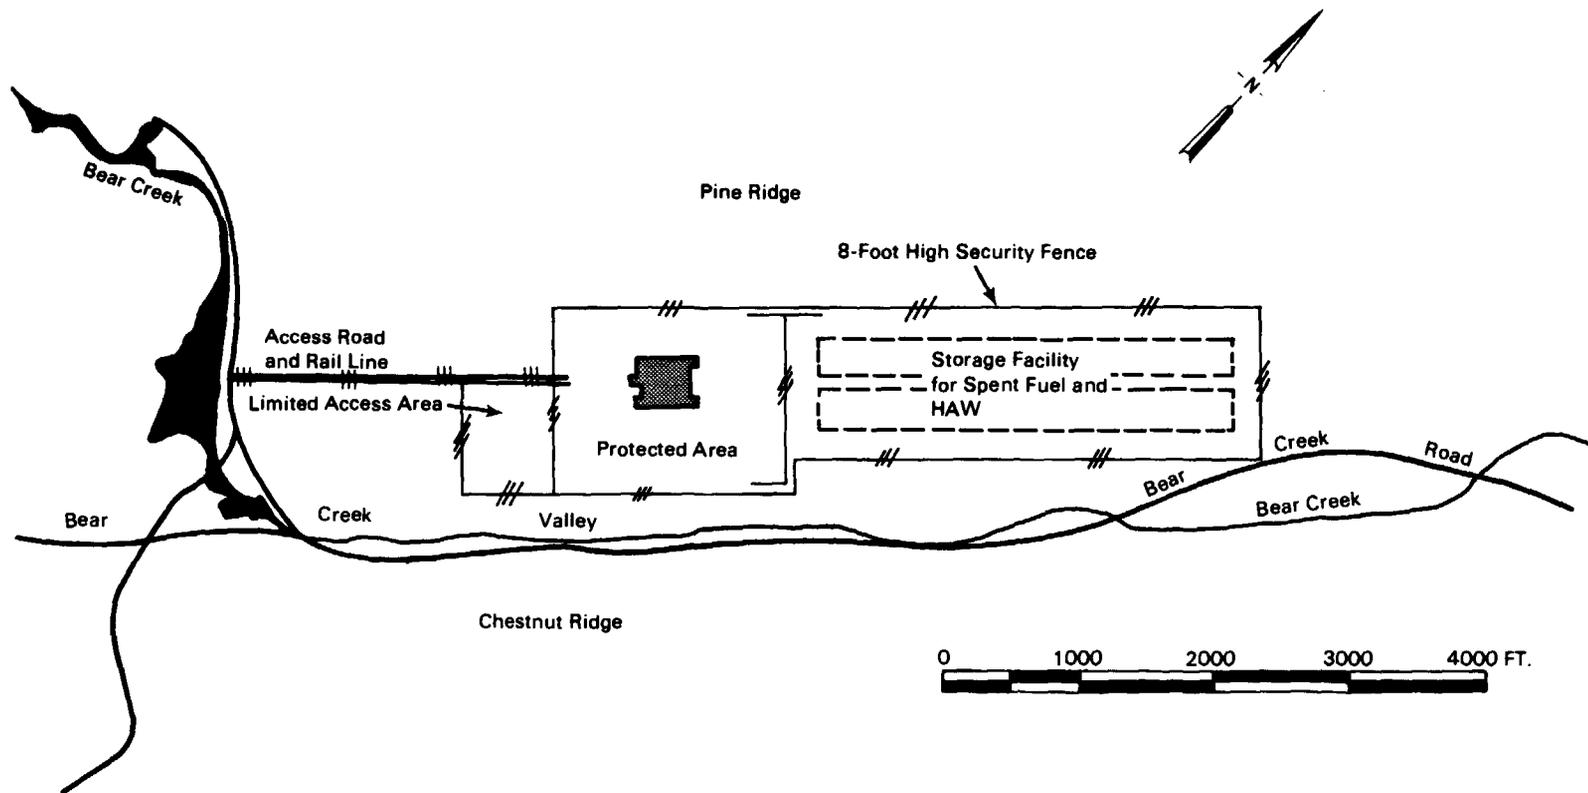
Layout of the Oak Ridge Site - Field Drywell Design
